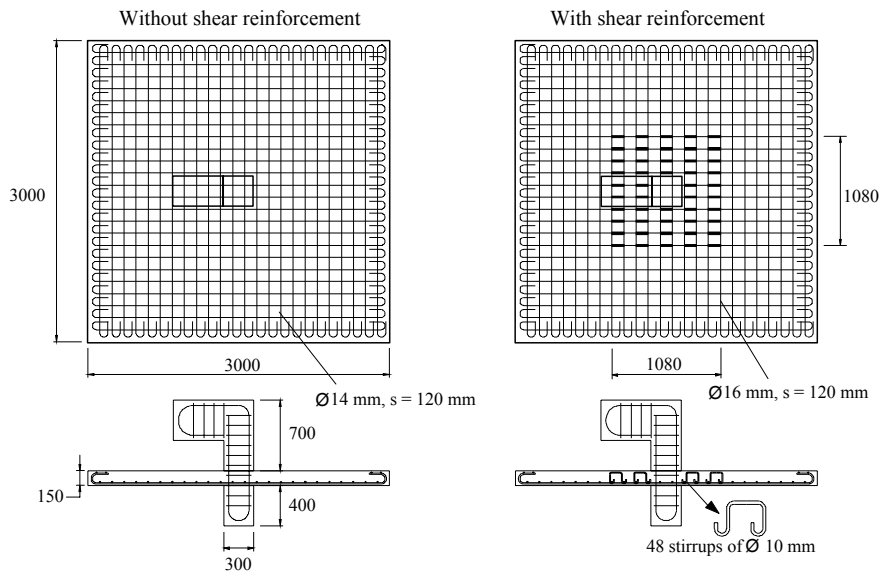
Longitudinal and shear reinforcement (dimensions in mm)
